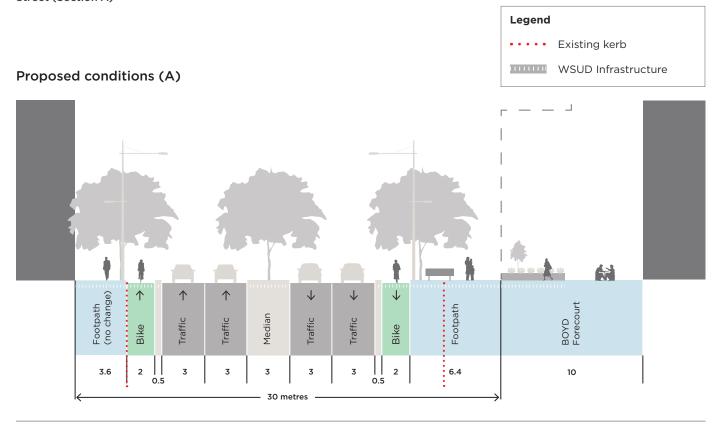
Proposed conditions of City Road looking east towards Power Street (Section A)
